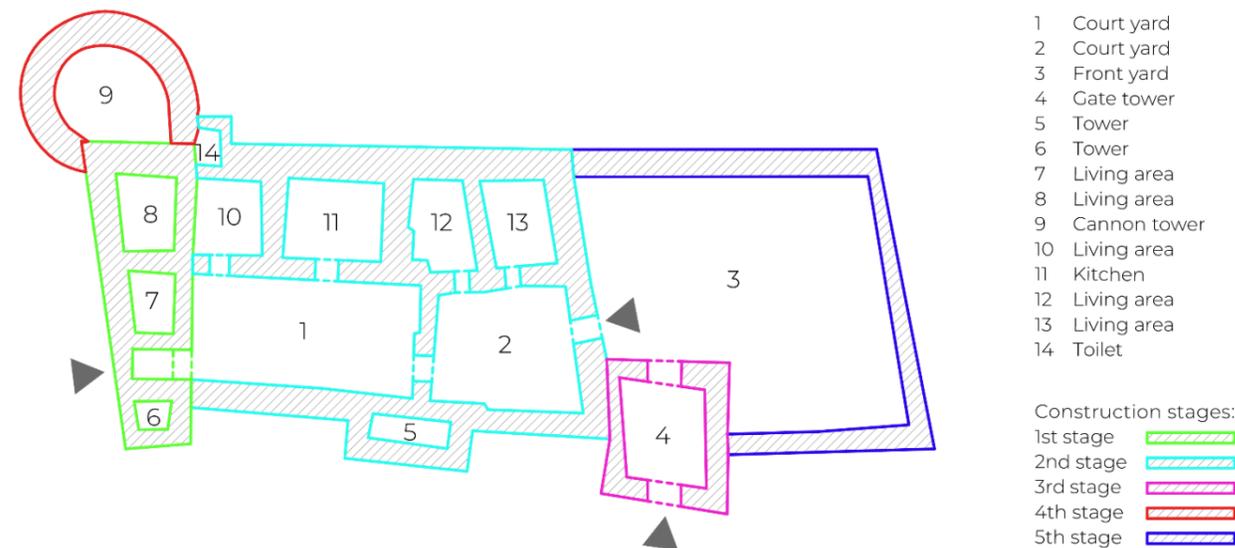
The latest floor plan with construction stages of Toole castle based on K. Aluve's (1993) drawings (by author)
